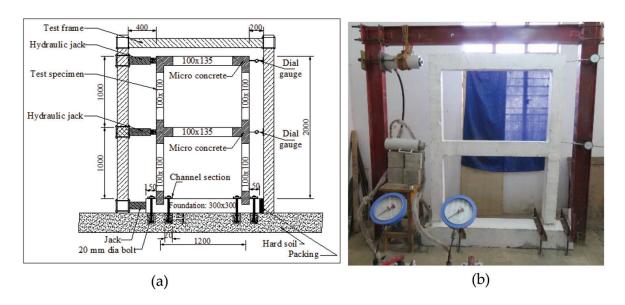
Testing of RC frame (a) test set-up (b) actual testing arrangement.
